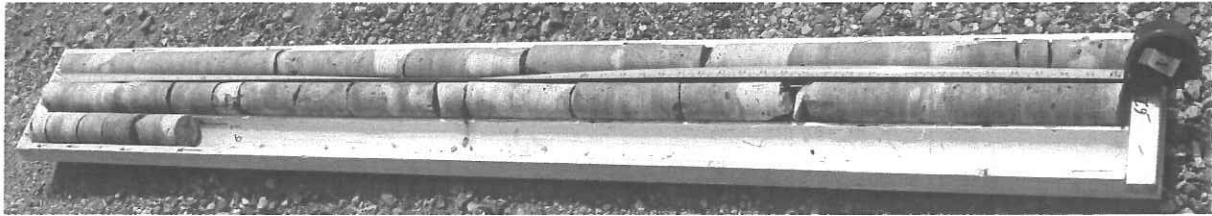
BH10-2 – Depth 18.44 m to 22.25 m
